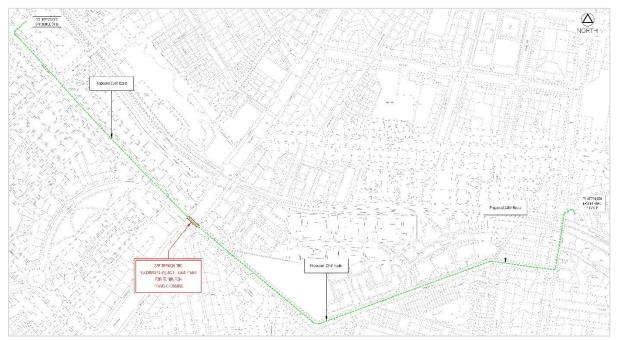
Proposed route from Shubhill GSP to Easter Road Primary
